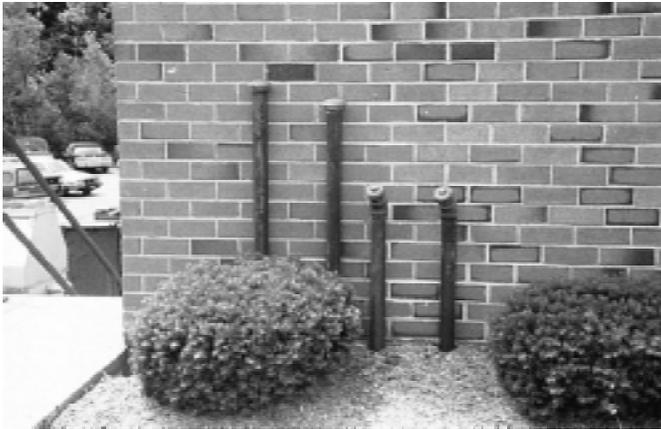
Two Fill and Vent Pipes Leading to Two Underground Storage Tanks
